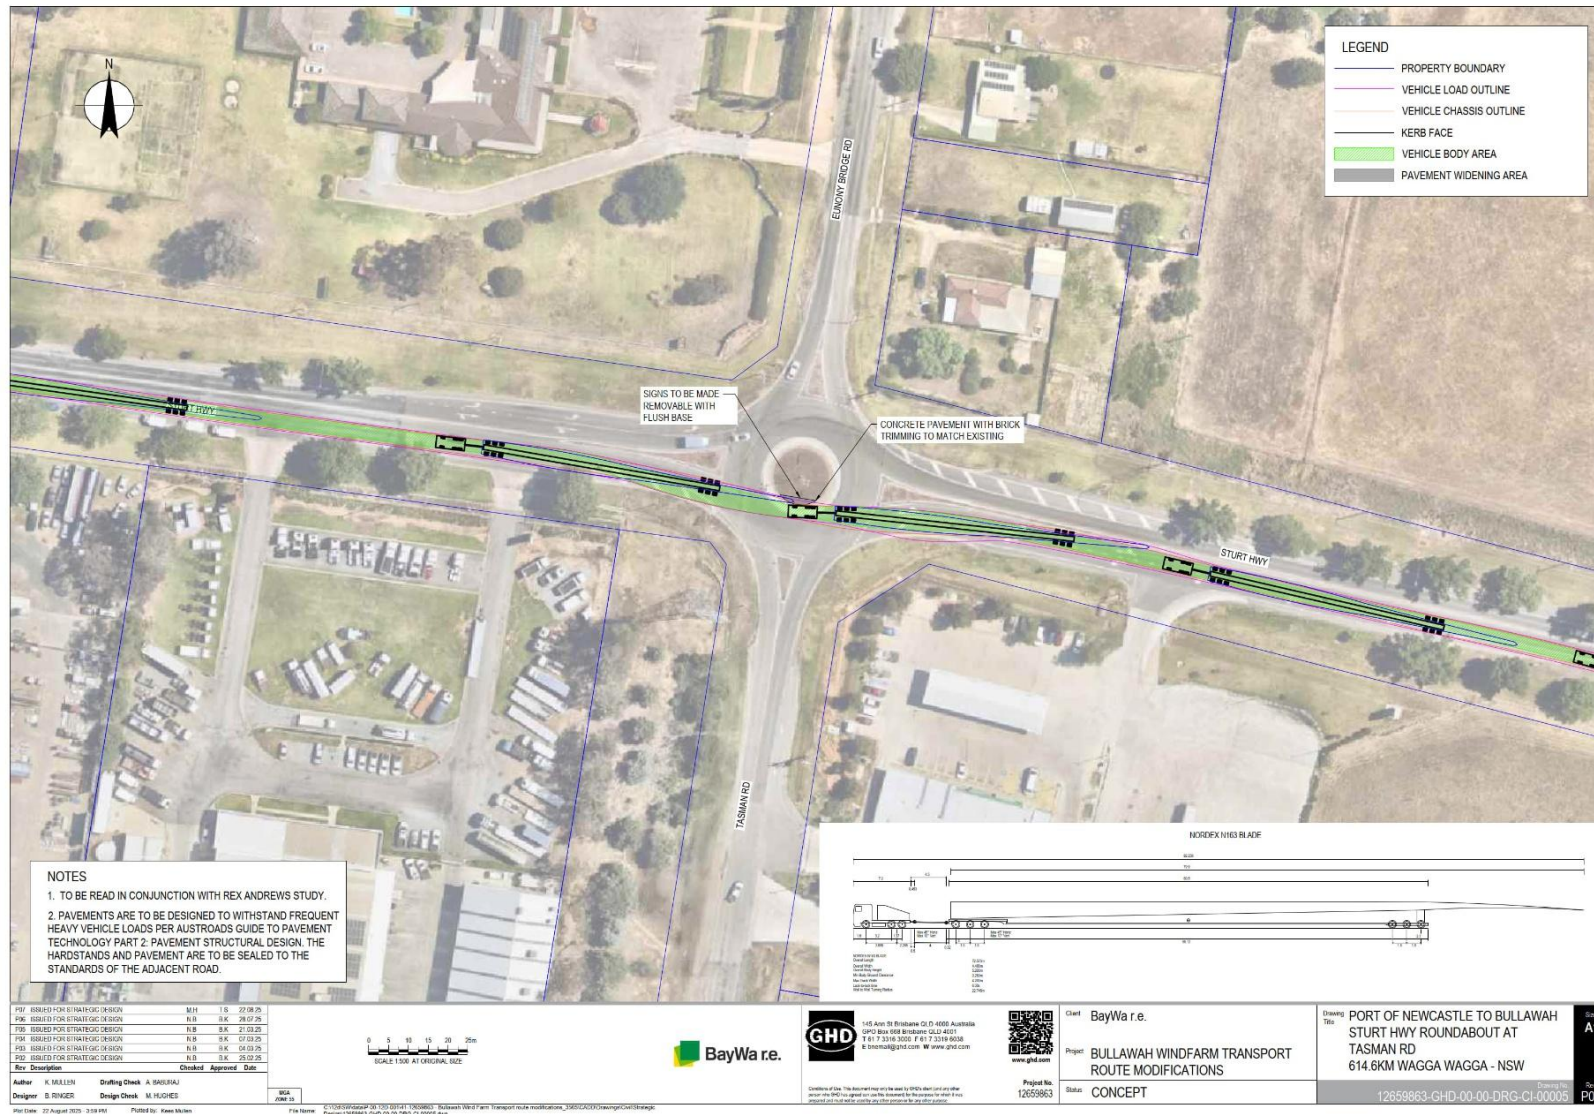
Roundabout at corner of Tasman Road and Hammond Ave
